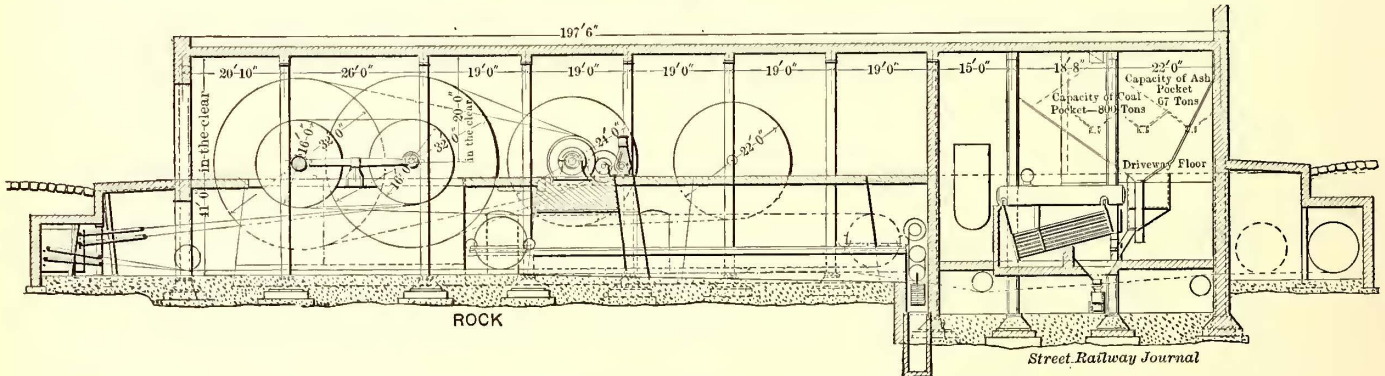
SECTION OF LEXINGTON AVENUE CABLE POWER STATION—NEW YORK CITY.
